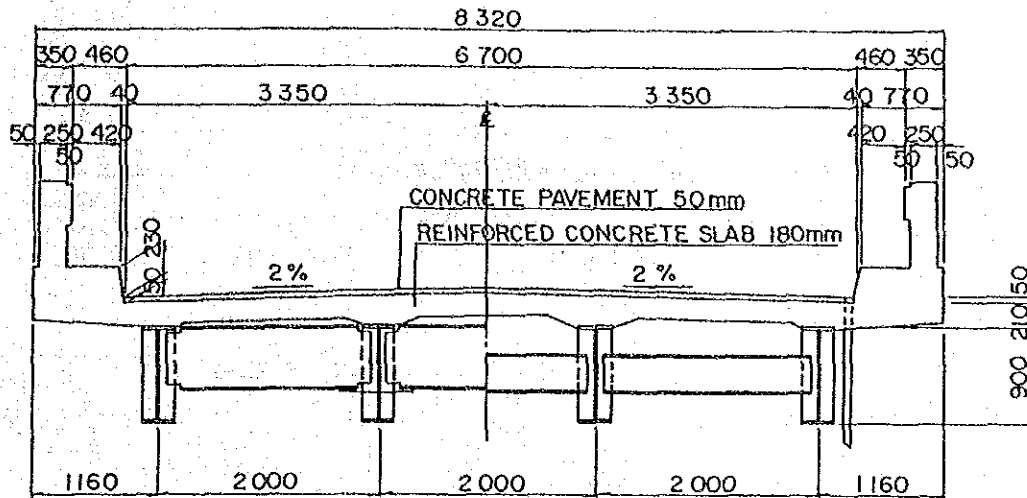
(1/4) TYPICAL GENERAL VIEW OF BRIDGE
